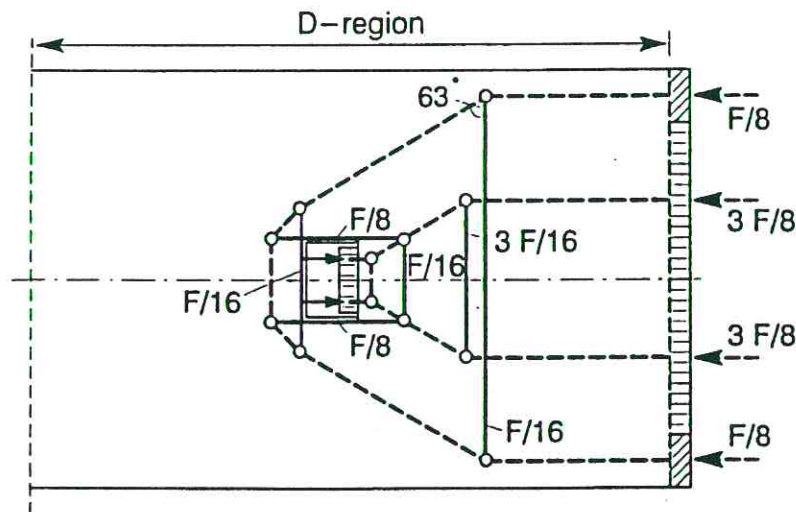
Strut-and-tie model for an interior anchorage of a tendon
